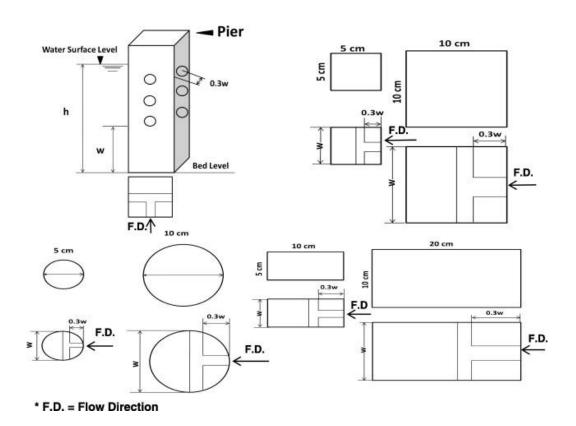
, Piers shapes and opening arrangements (Entesar et al. 2013)
